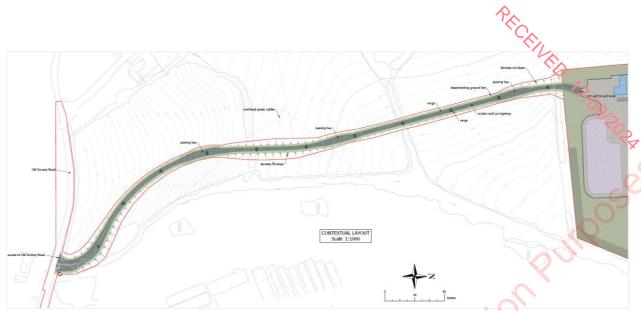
Access Road from Scrouty Road to Proposed Development. (Cropped and rotated) Drawing Ref: 24052-DR-0101 – Kilgallen & Partners
